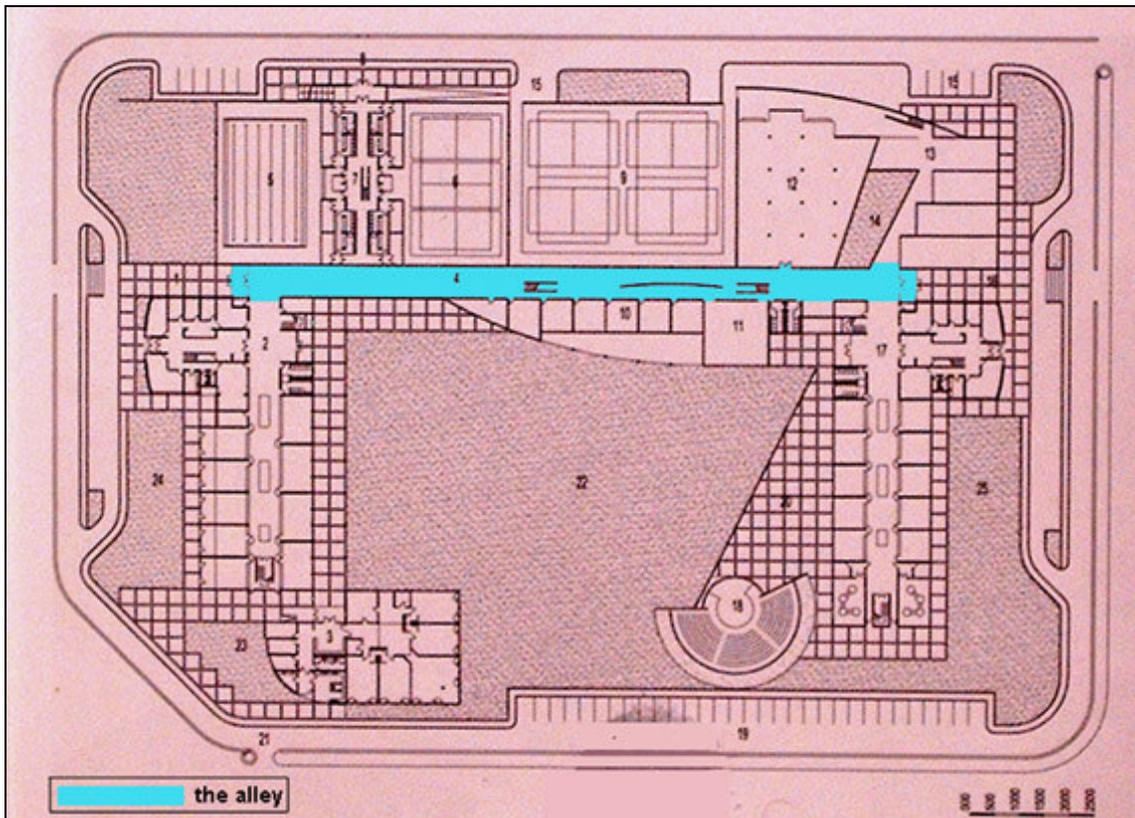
Ground floor plan and the alley of Işıkkent ES.
